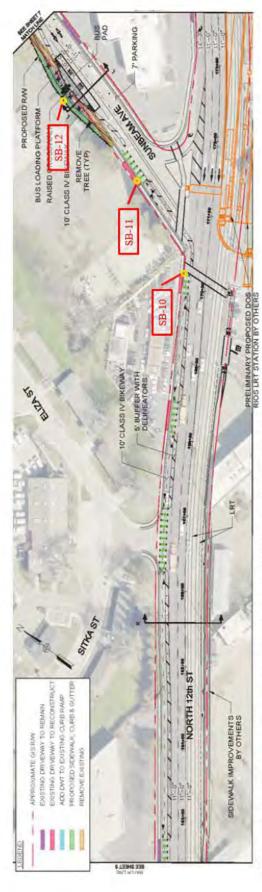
Soil Boring Locations SB-10 through SB-12, North 12th Street, Sacramento
